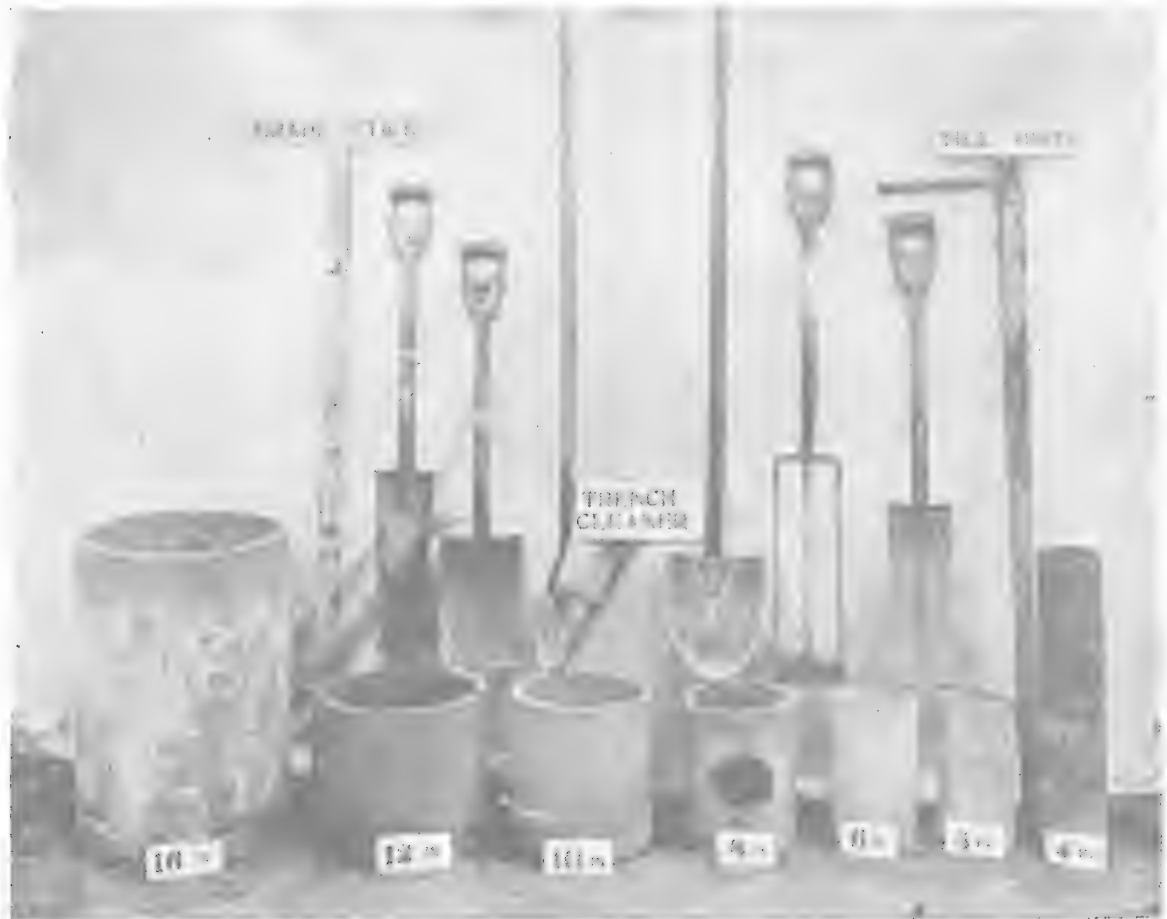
Samples of drain tile and the necessary tools used in constructing systems of tile drainage. (Wisconsin Station.)
